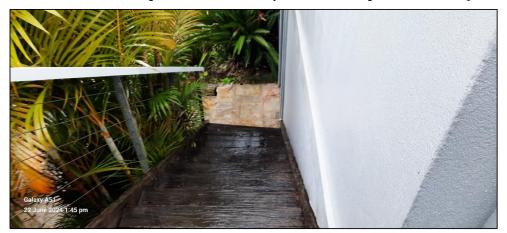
Timber pathway leading down to stone paved patio of project site looking east.
